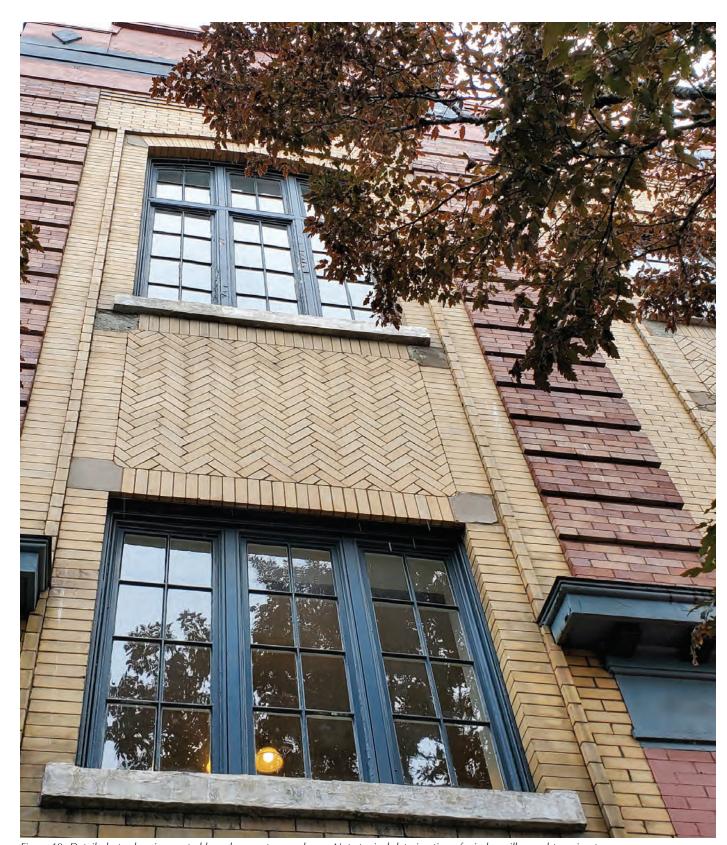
Detail photo showing central bay above entrance alcove. Note typical deterioration of window sills, sandstone insets, and wood window frames.
